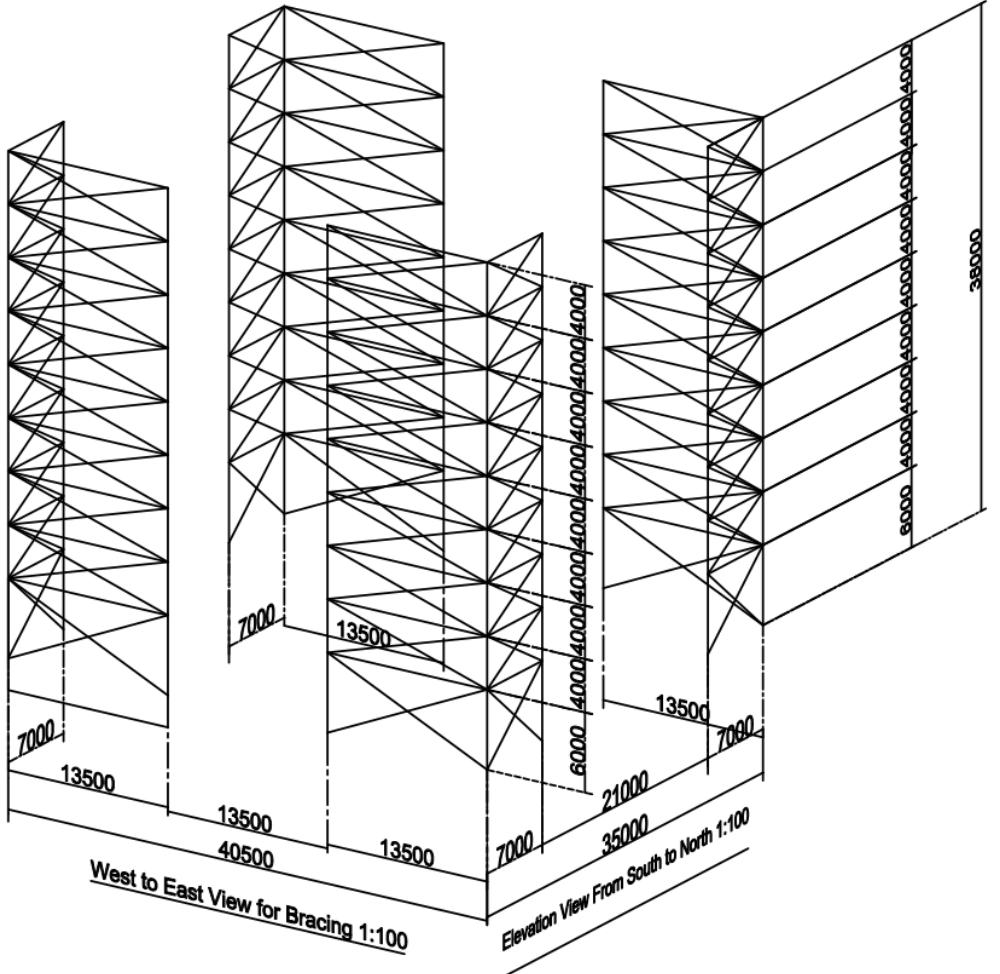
Global View for Bracing in the Structure (Highlighted Stability System)
